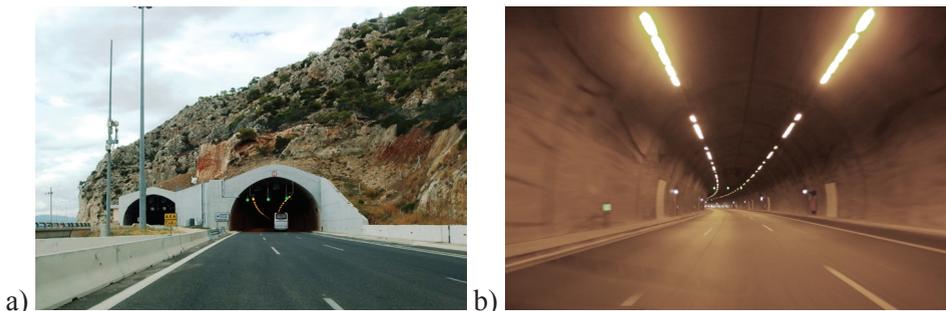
The short highway (Athens-Corinthos) tunnel a) portal of entry/exit b) tunnel view
